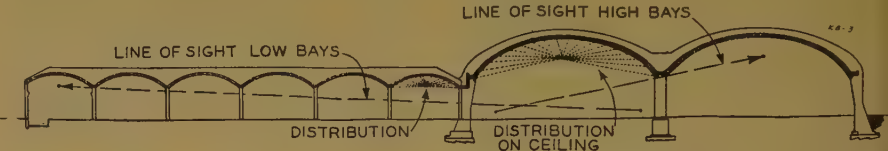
Cross section of building showing relative size of large and small bays and distribution of light on ceiling and shielding angle
